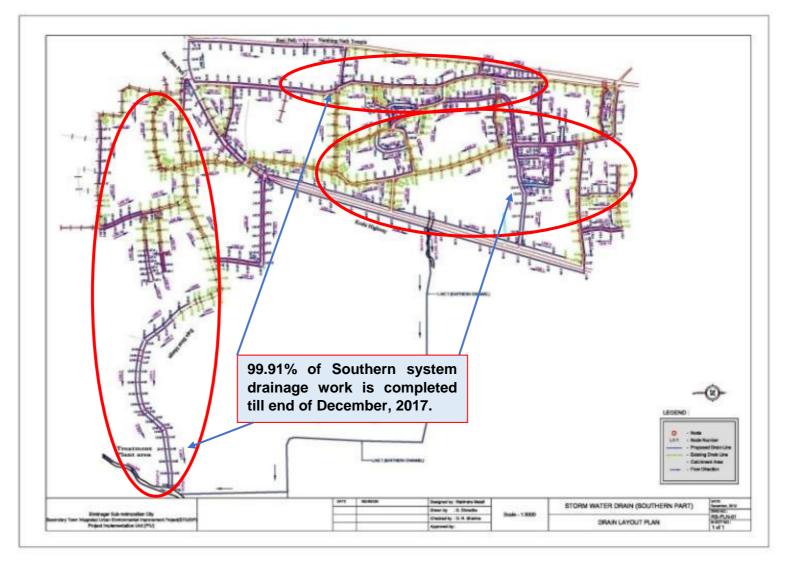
PROPOSED STORM WATER DRAINS IN BMC (Southern Drainage System)
